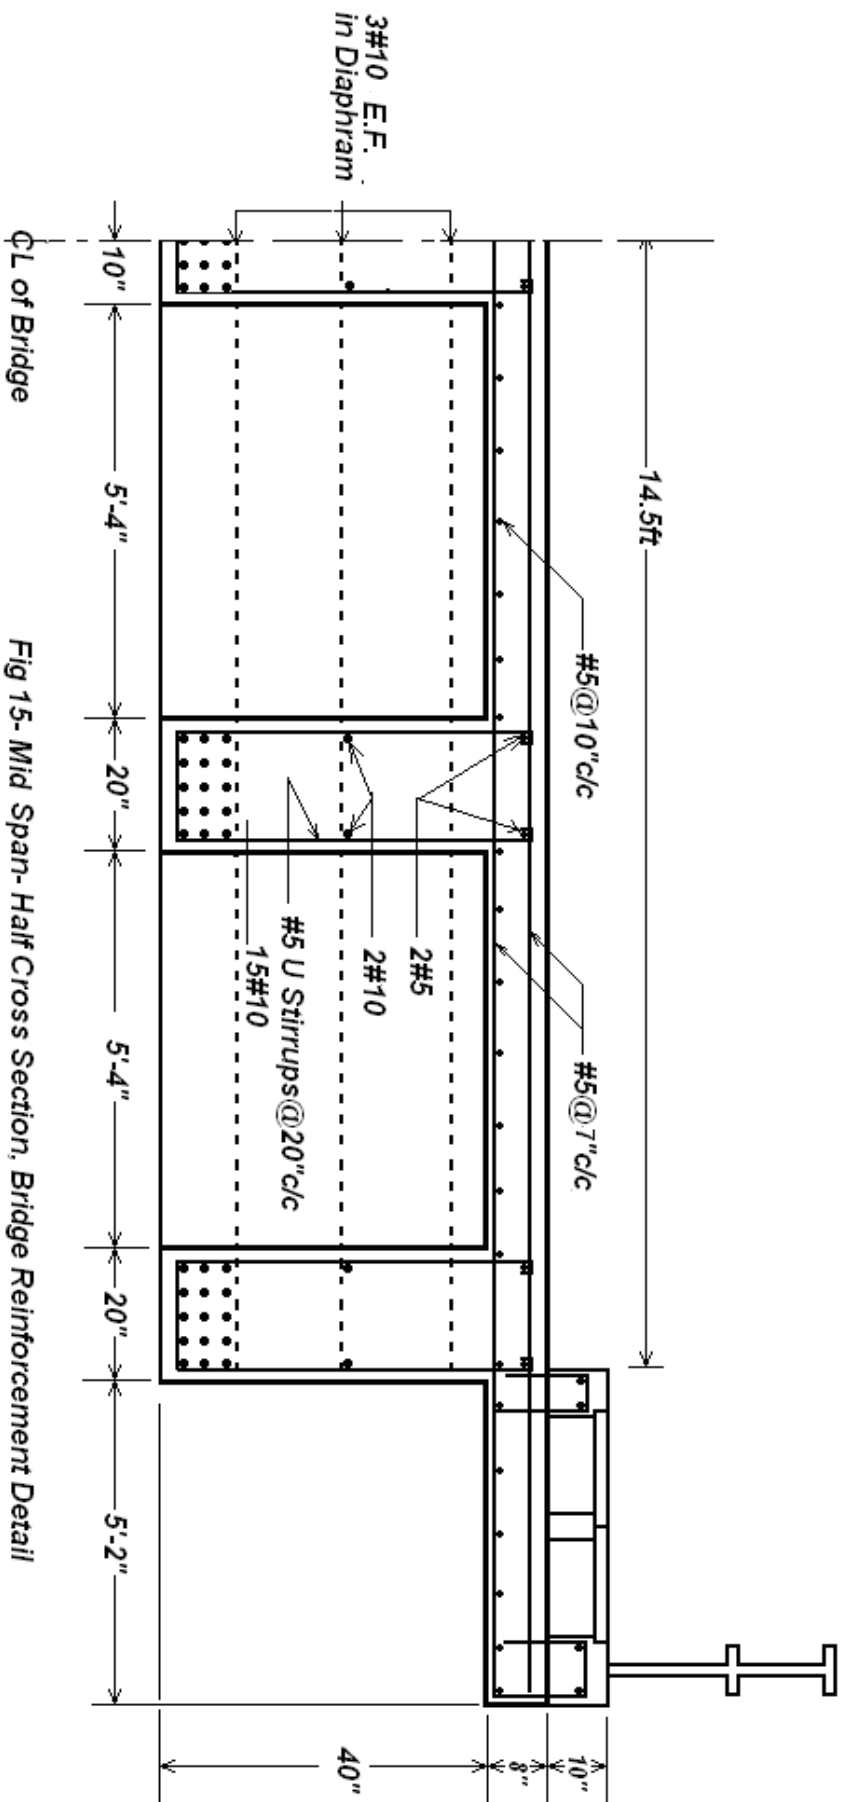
Mid Span- Half Cross Section, Bridge Reinforcement Detail
